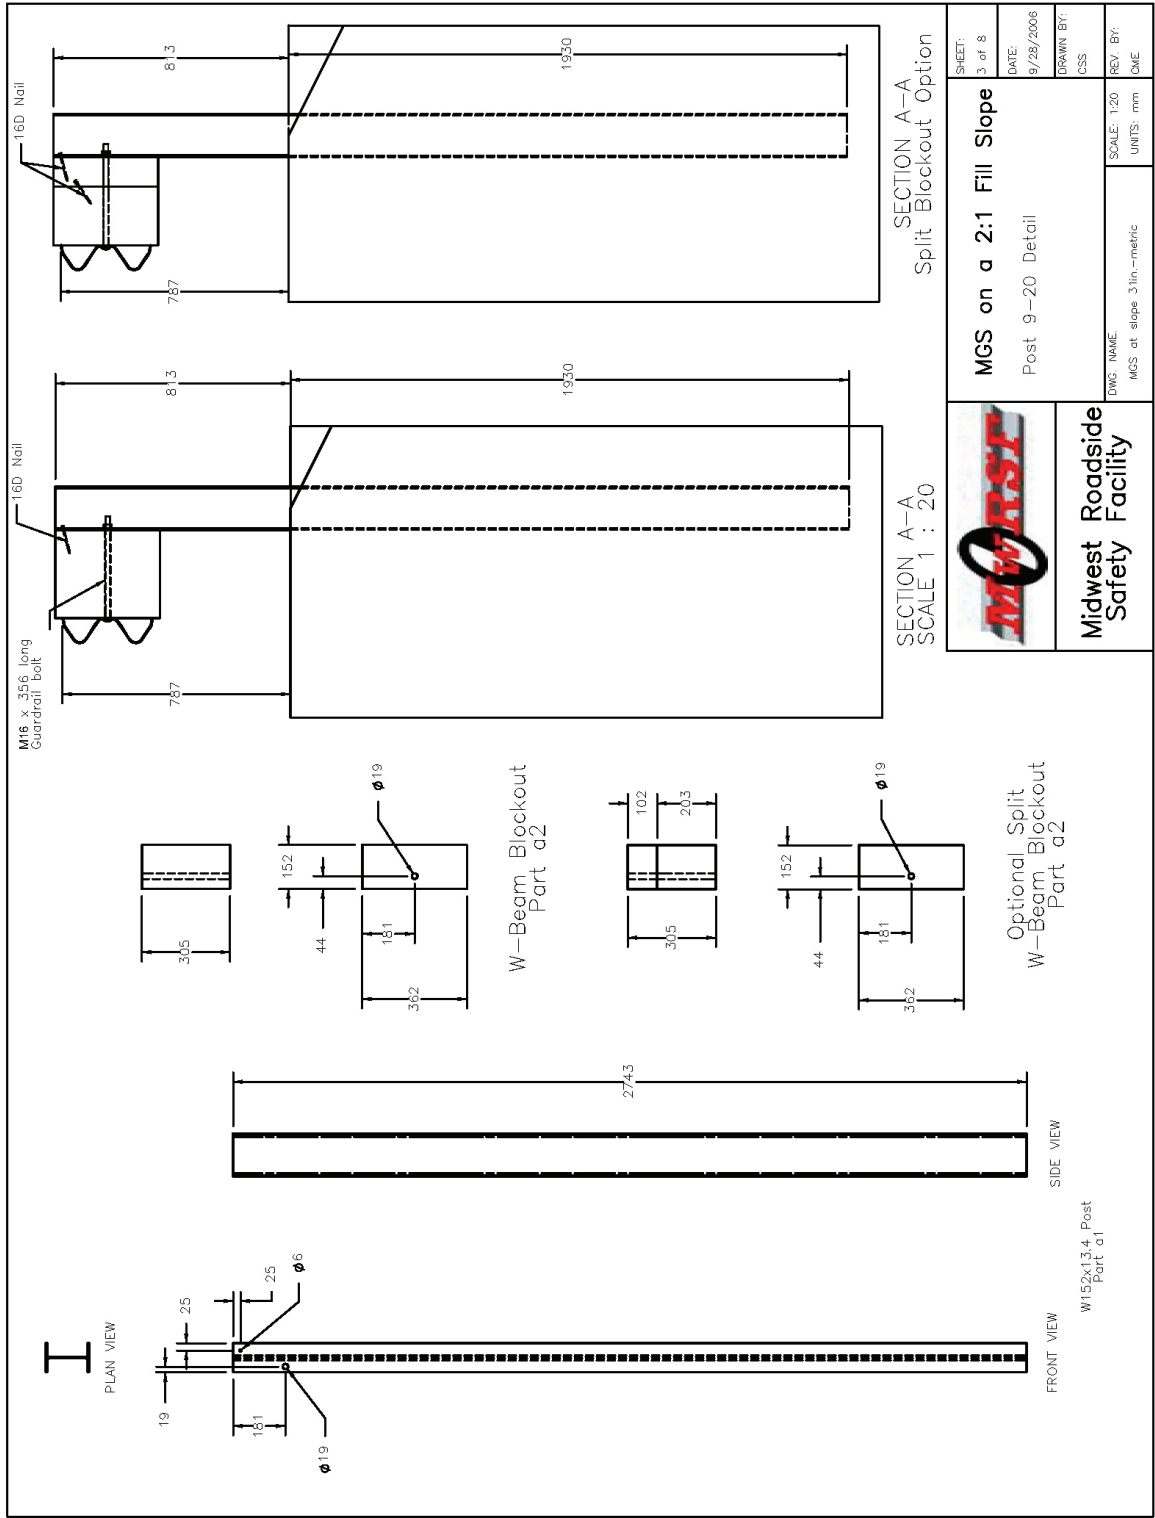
MGS Installed Adjacent to a 2:1 Fill Slope System Modifications, Test No. MGS221-2
